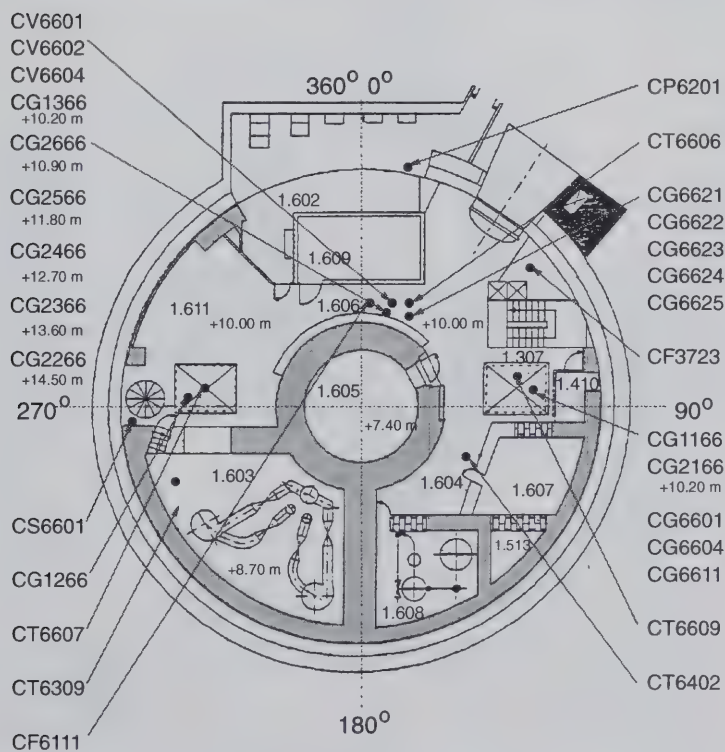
Level 1.600 at the +12.0 m Elevation
